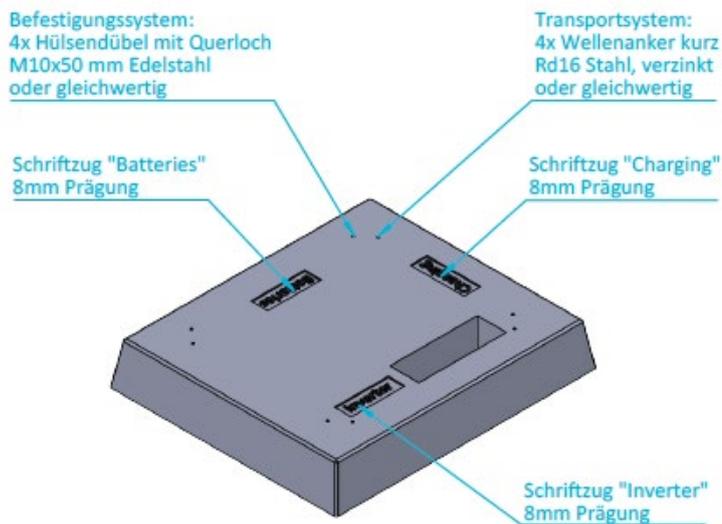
EXAMPLE OF A PREFABRICATED FOUNDATION (DETAIL FROM CONSTRUCTION DRAWING)
